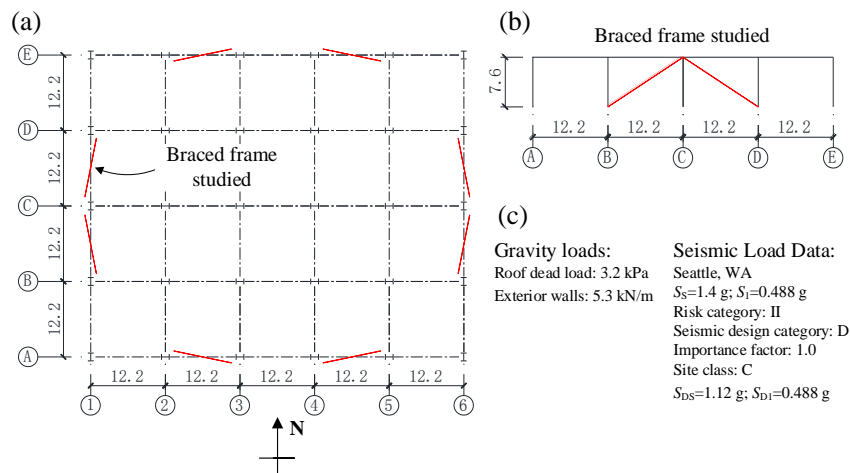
Example building: (a) plan view; (b) side elevation view; and (c) load information
